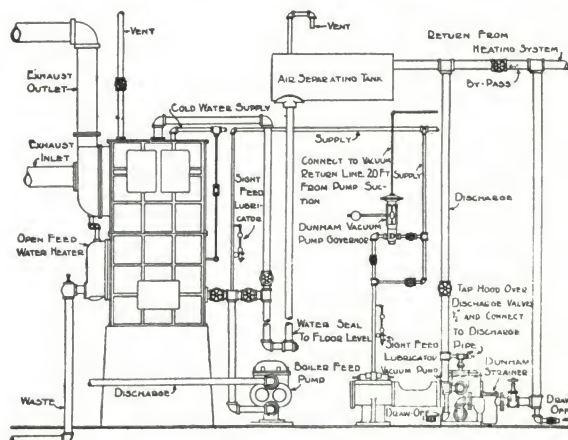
A. Connections to Steam Operated Vacuum Pump, Automatic Boiler Feed Pump and Open Feed Water Heater
